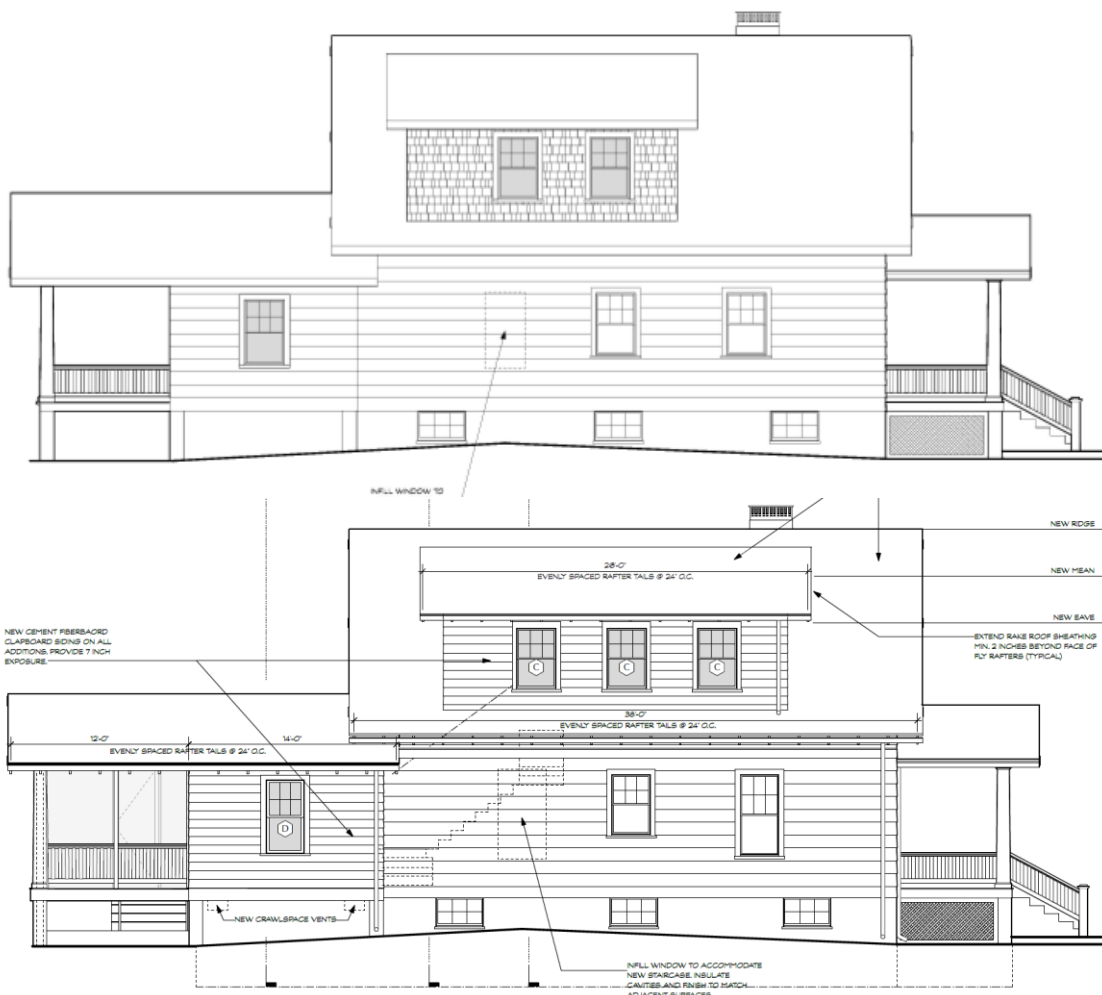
Previously approved east elevation (top) and revised elevation (below).
